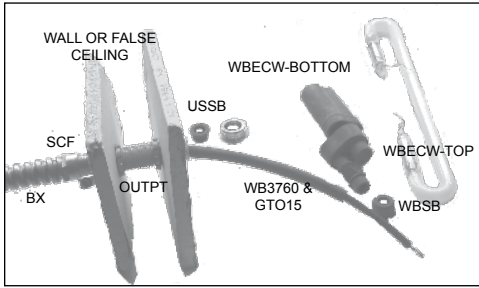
Slide WB3760 and GTO cable assembly into the OUTPT. Make sure you have 6" of this assembly standing out front for electrode connection.
